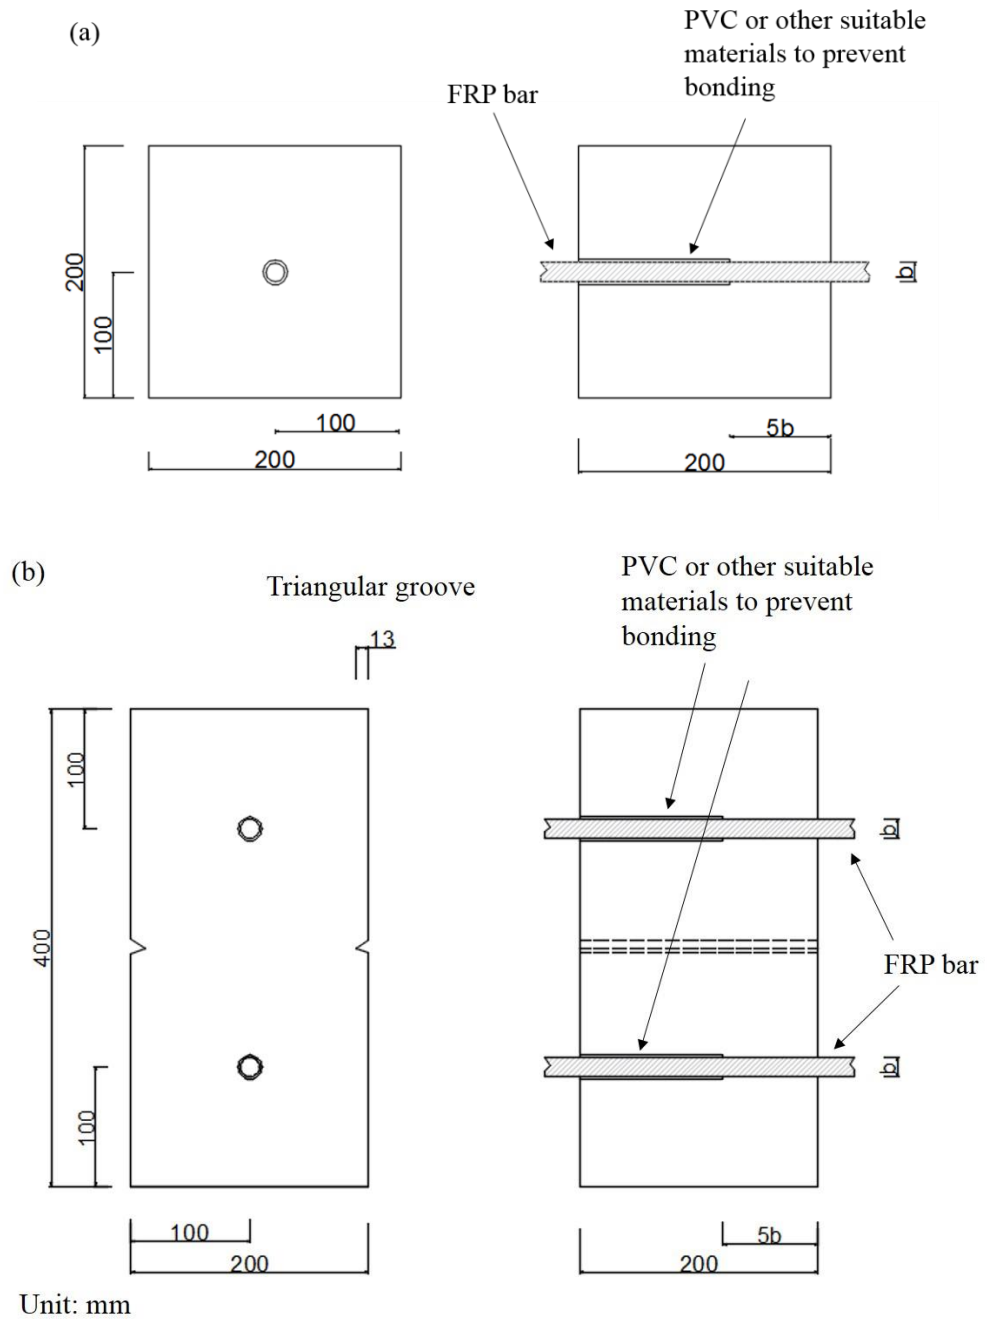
The pull-out test specimen casting methods by ACI 440.3R-04, (a) aligning the bar with the concrete casting direction and (b) aligning the bar transverse to the concrete casting direction
